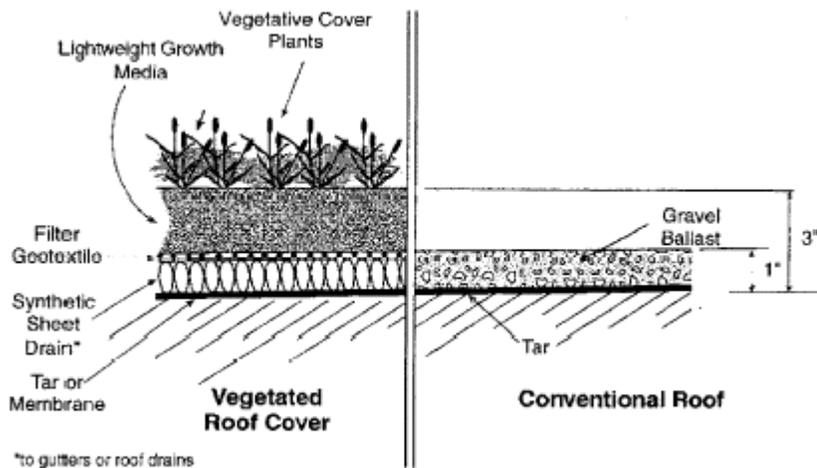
Example Vegetated Rooftop Cross-Section
